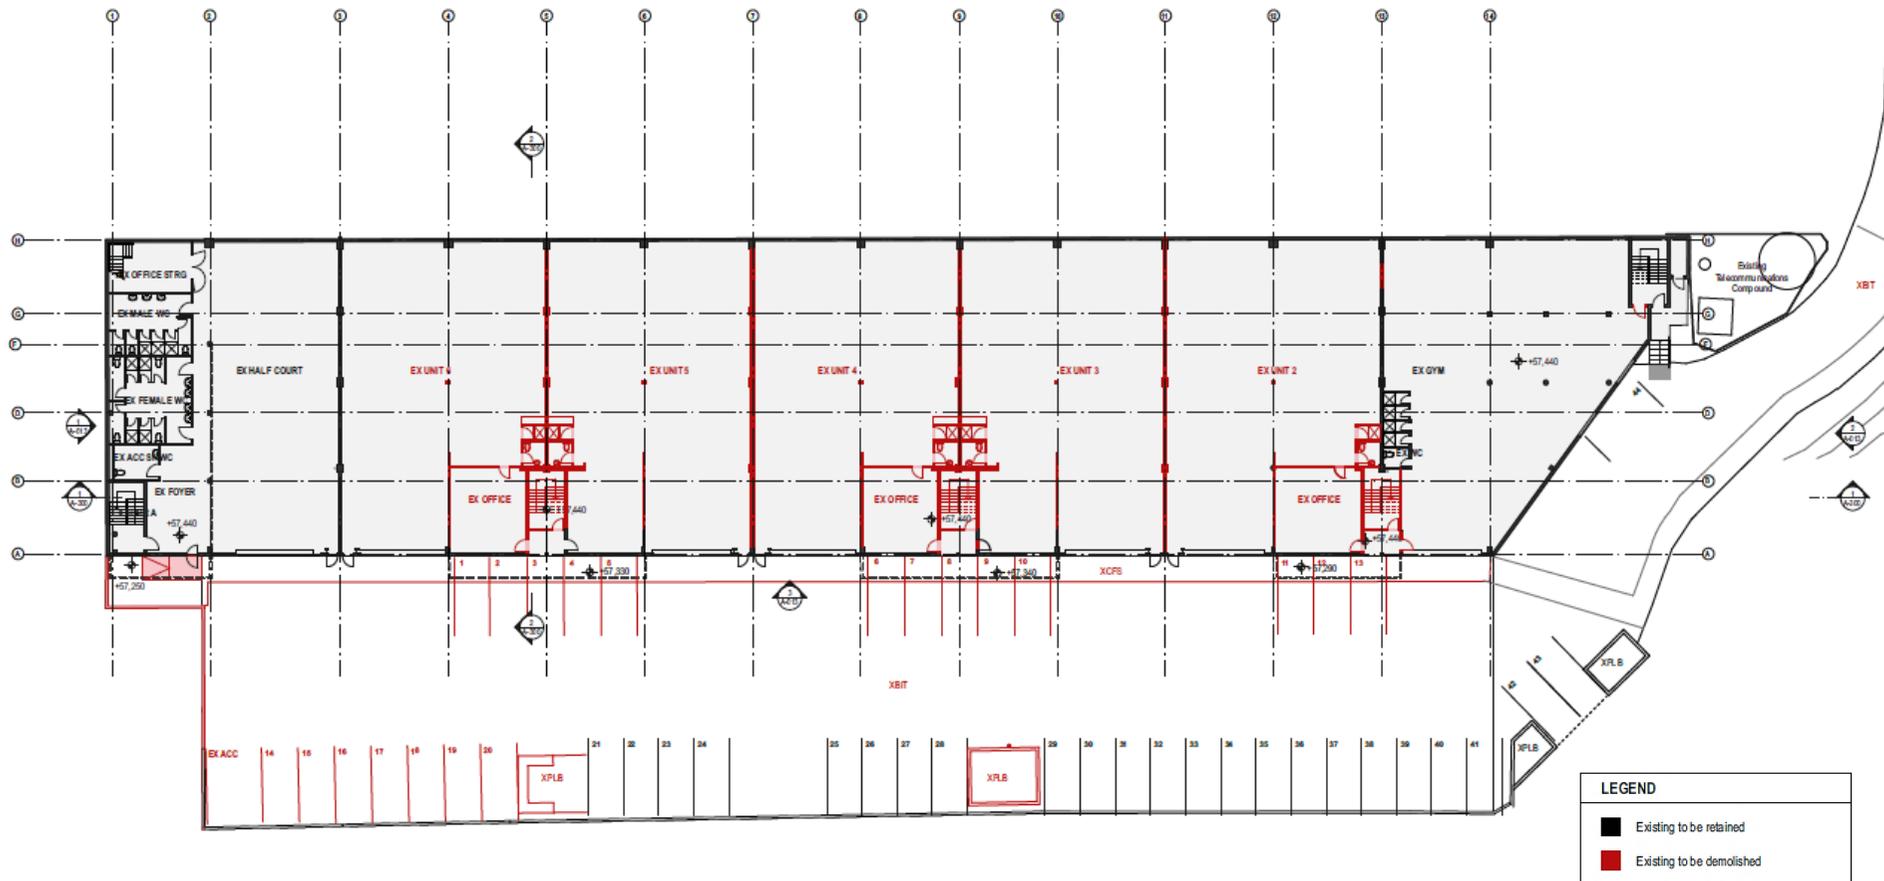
Extent of proposed excavations at 224 Headland Road (Source: Level 0 Demolition Plan\_224, A-040, 29/10/2019, Rev A, Tonkin Zulaikha Greer Architects)
